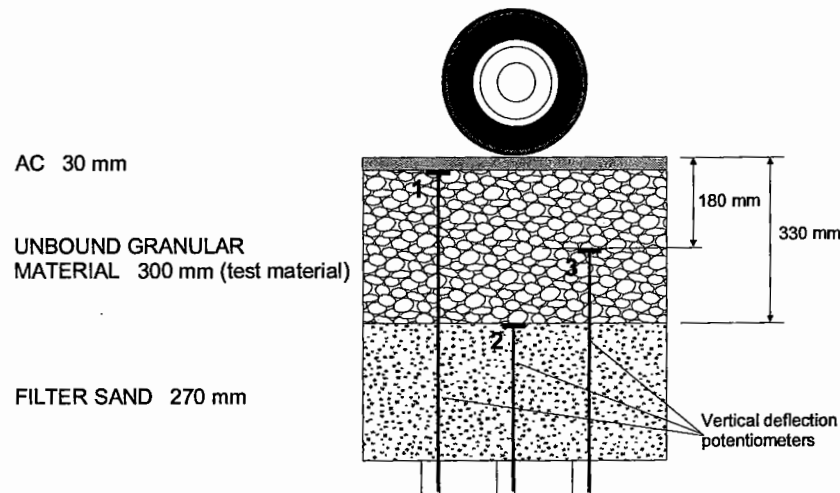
TEST PAVEMENT STRUCTURE
